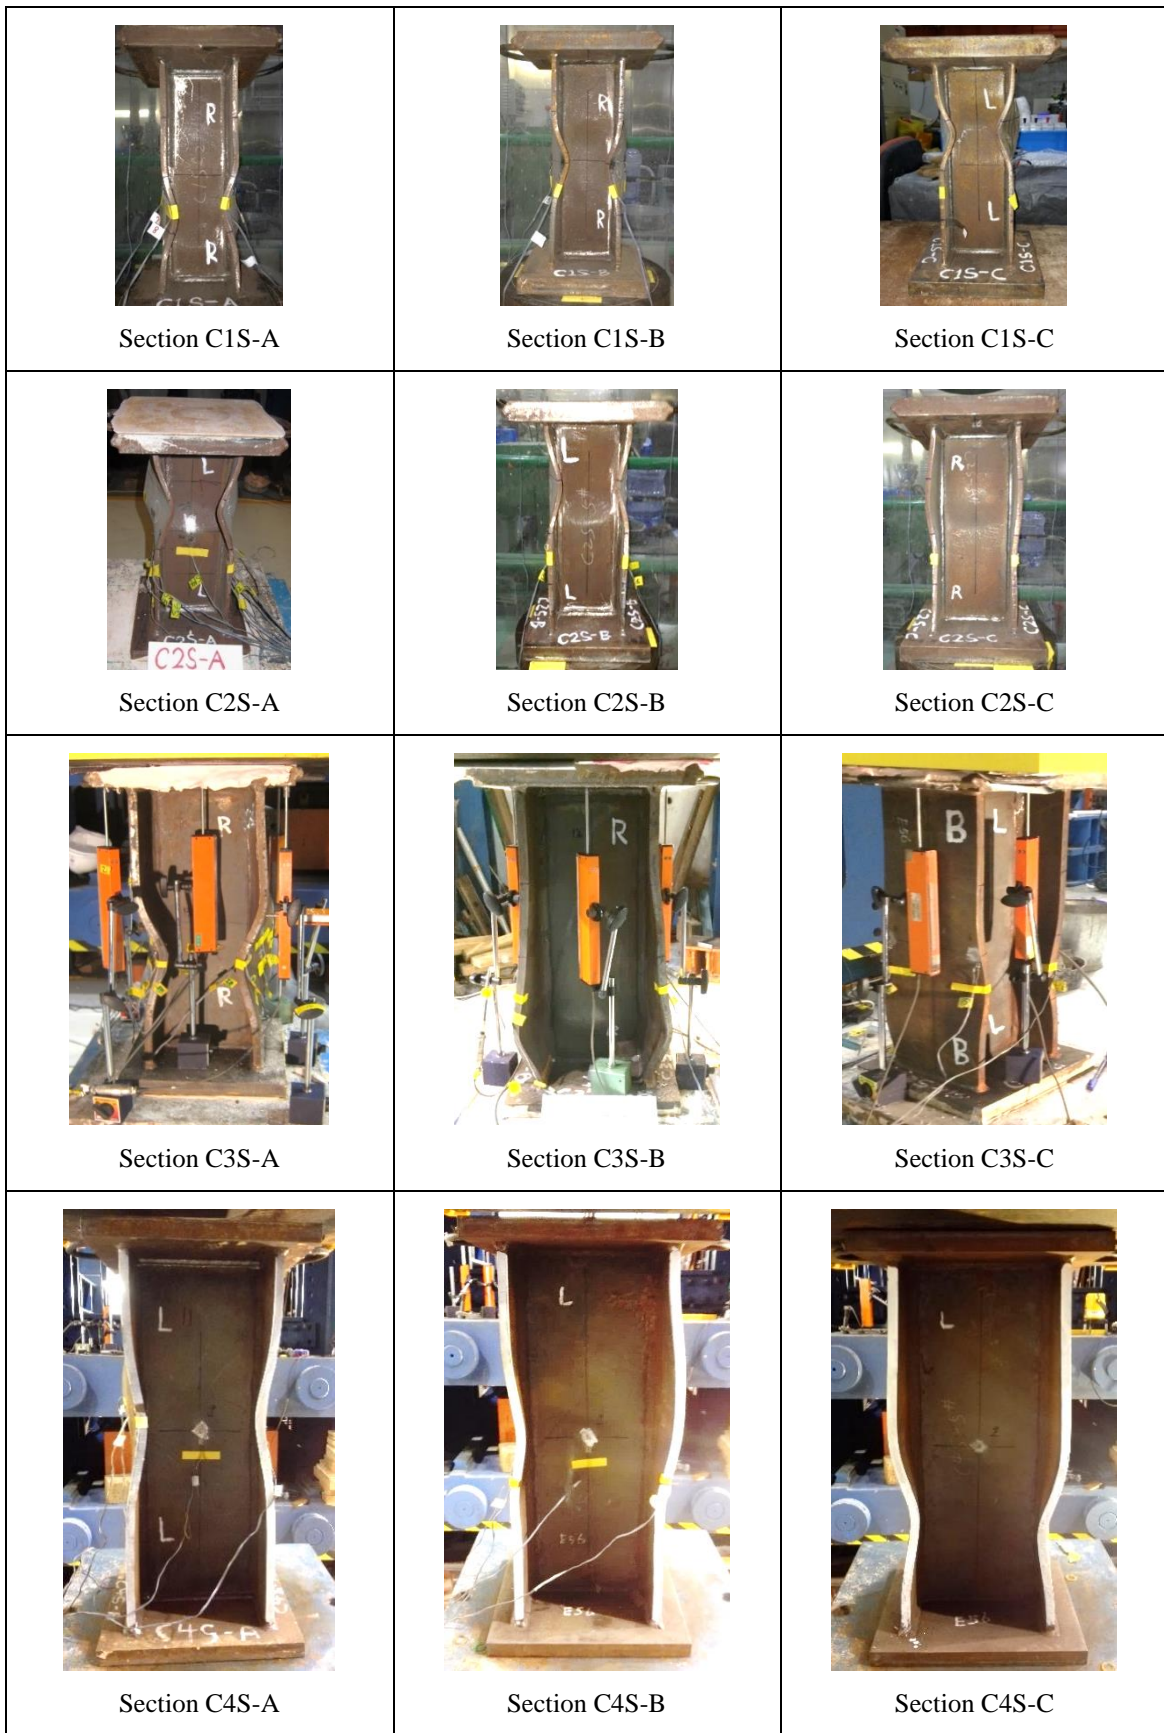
Deformed shapes of S690 reference welded H-sections after tests
